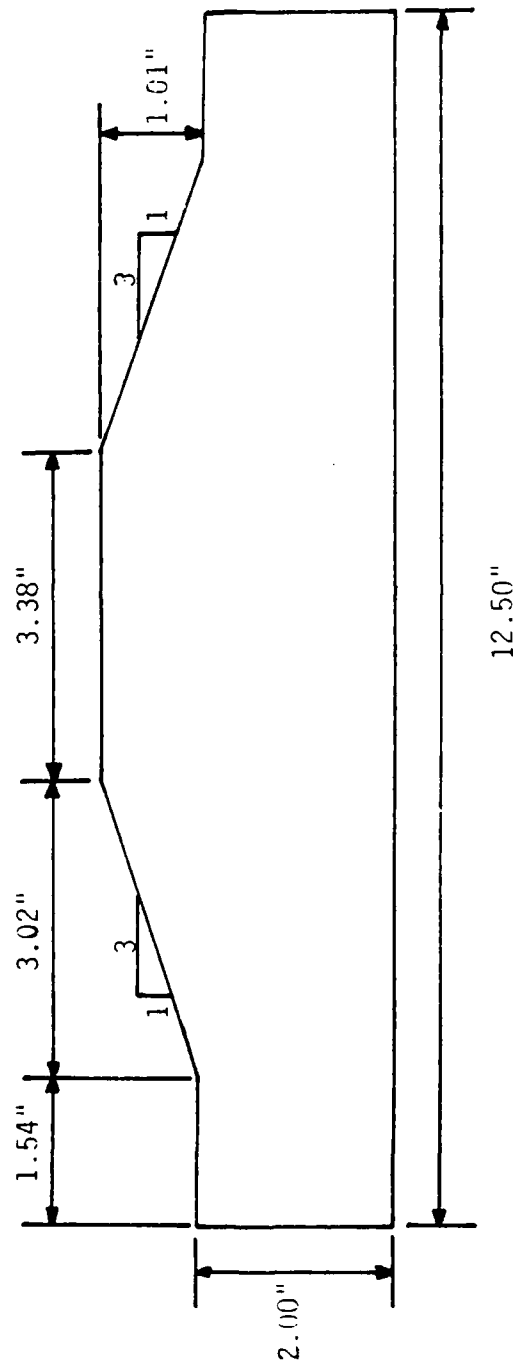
1/71st Scale Erodable Full Embankment Section Model
